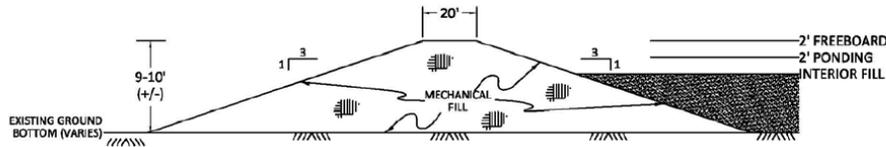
Typical Bayou UCPA Initial Dike Section
